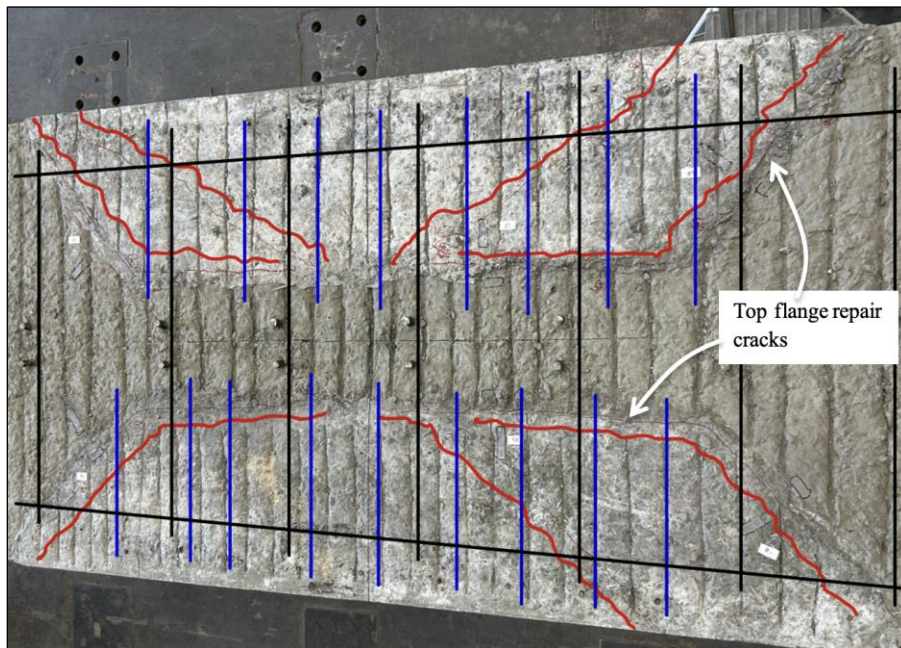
Photo. Test 1.4.F (repair 1.3RTF, 1.3LTF) overall top flange cracks at 80 kip.
